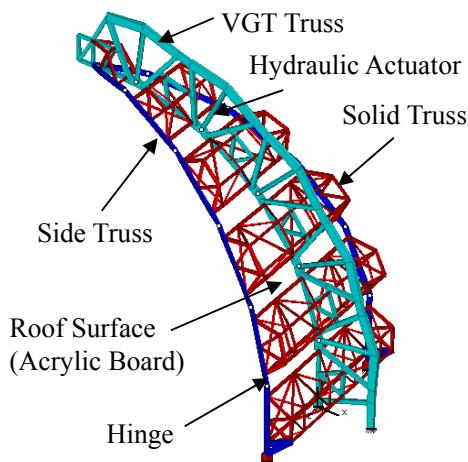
Roof Structure Installed VGT   Figure 14 Schematic Structure of VGT Dome Model
